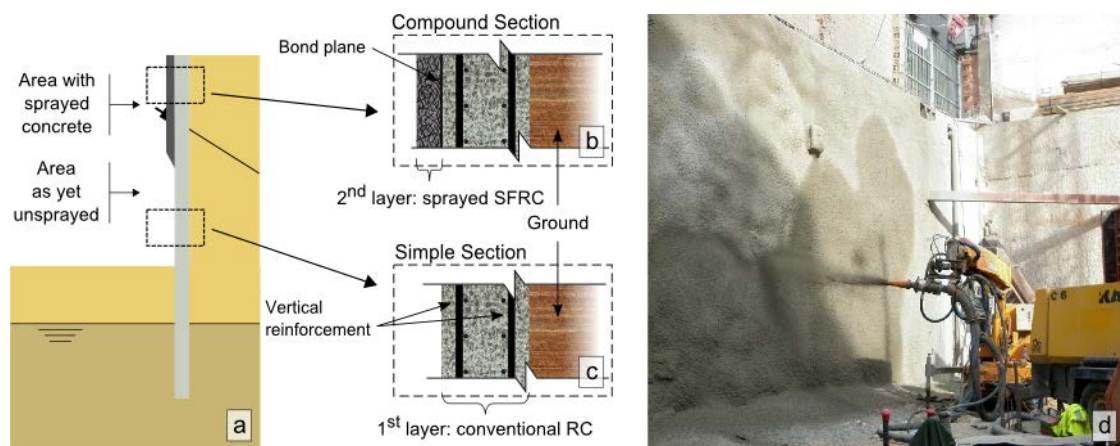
Bi-layer diaphragm walls. a) general scheme; b) compound cross-section; c) simple cross-section; and d) spraying of an experimental wall.
